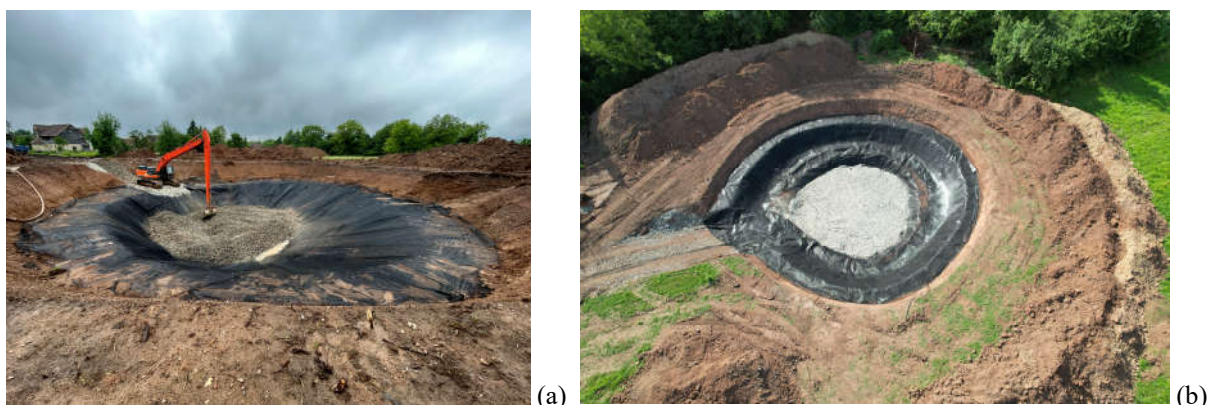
Backfilling works using long reach excavator (a) and aerial view of material type 2 placed and compacted (b)
